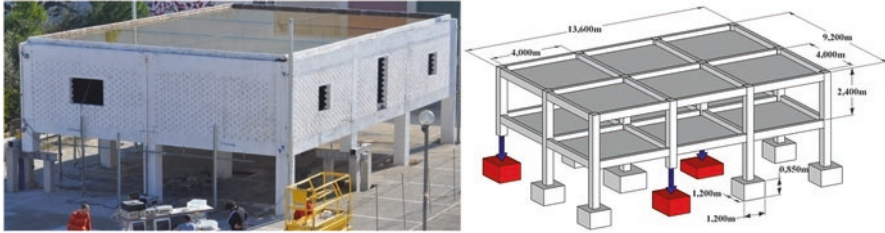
Two-story infilled RC frame building, for instant loss-of-column tests
